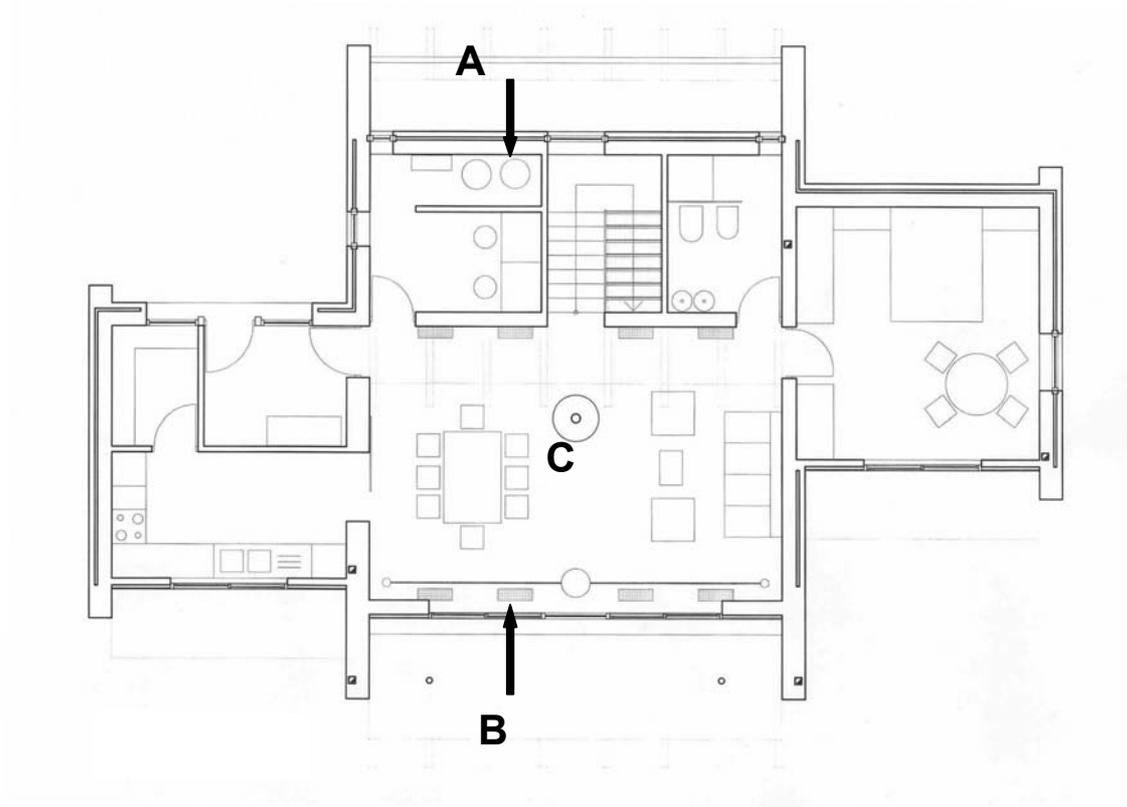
Site plan of the Bioclimatic House Project.
